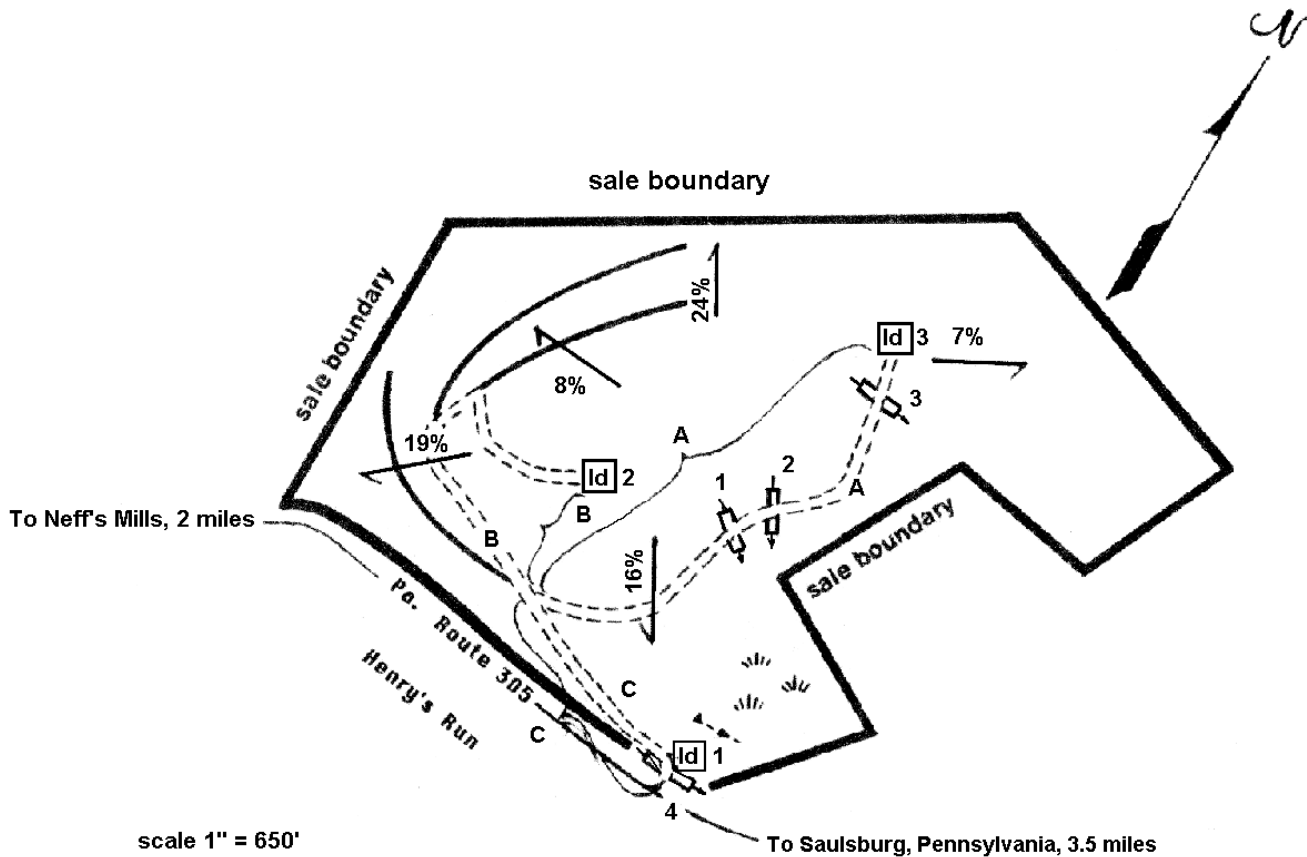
is an example of a typical timber harvest site plan and Figure 14.3 is an alternative timber harvest site plan. If a legible photocopy of a USGS topographic quad map is submitted as a location map for the E&S plan, as specified in the Timber Harvesters Action Packet, the contours need not be duplicated on the site plan.
